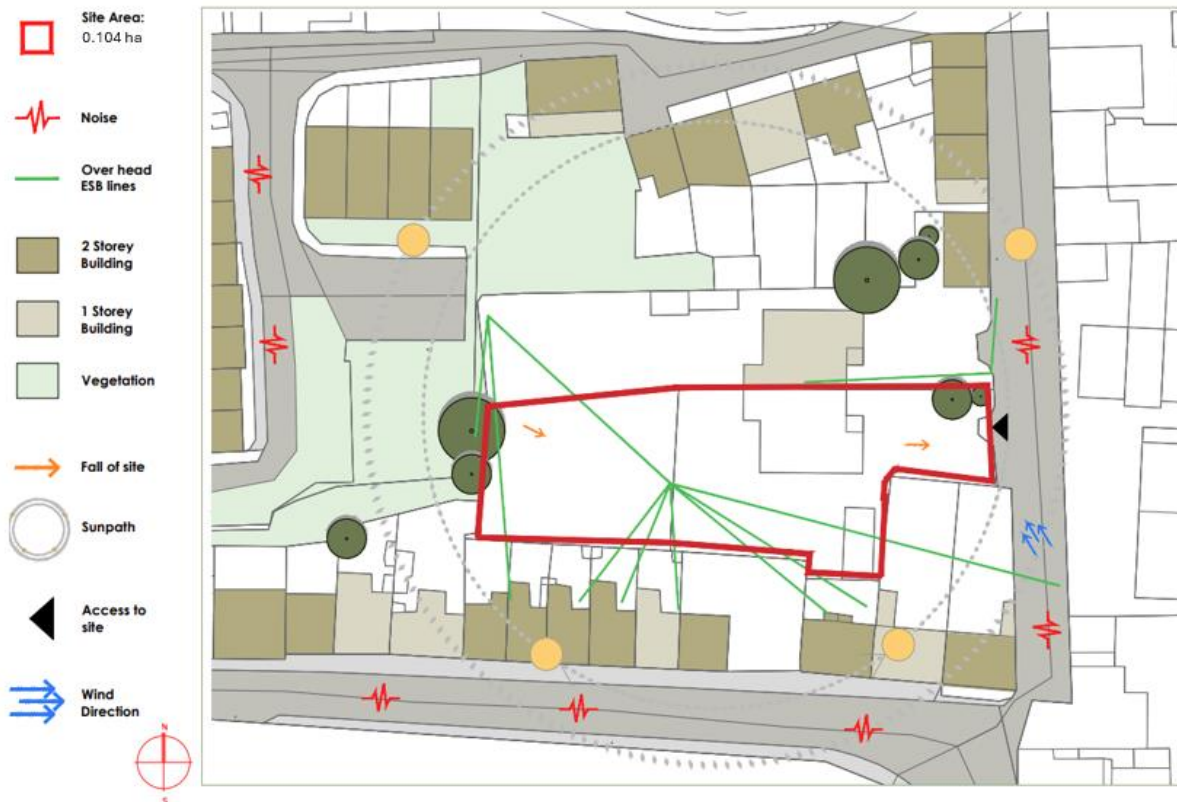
Site analysis by author indicating prevailing wind, traffic noise, vegetation, services & fall of site and context
